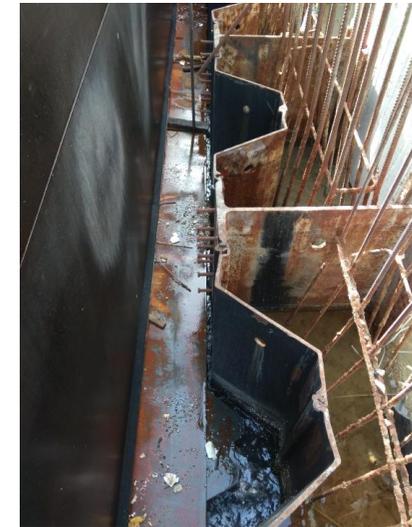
Bottom panel against sheet-pile wall with AZ shaped panels to cover the inner gaps of the wall
